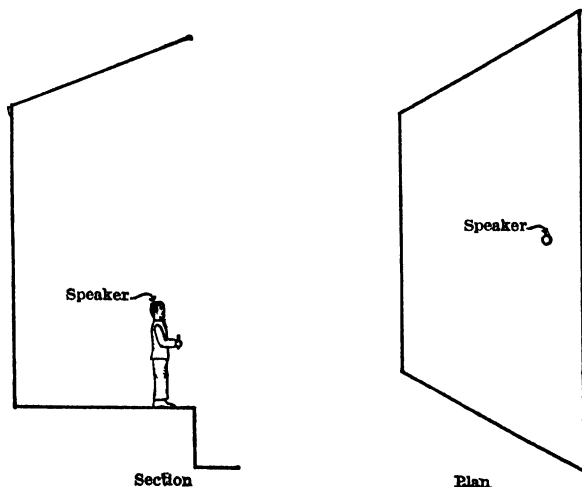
Plan and Section of Reflecting Walls about Speaker or Musician to Give Perfect Generation of Sound
